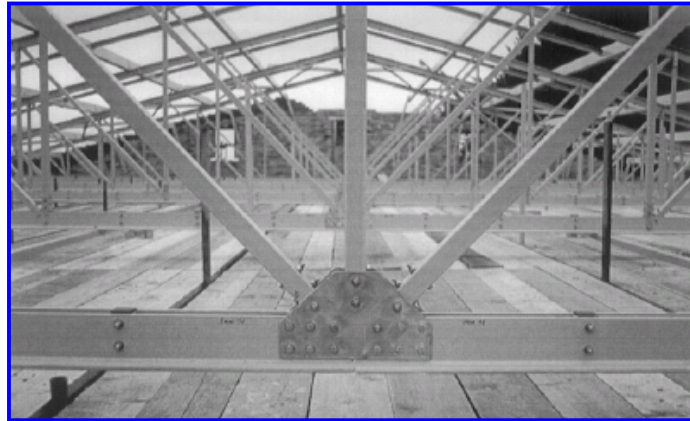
Composite trusses for storage reservoir roof at Darvel (Gilby, 1998)
